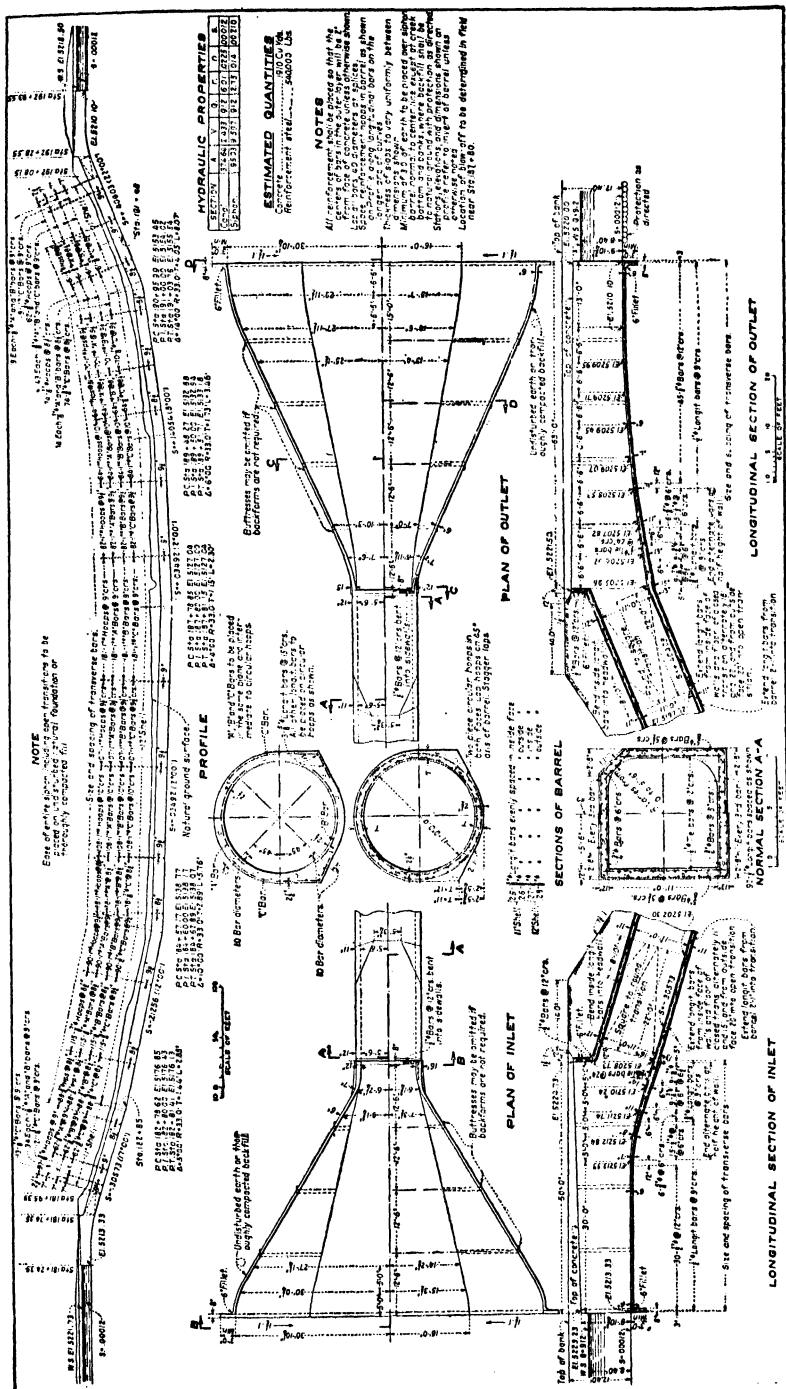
Reinforced-concrete siphon, Heart Mountain Canal, Shoshone project, Wyoming.
